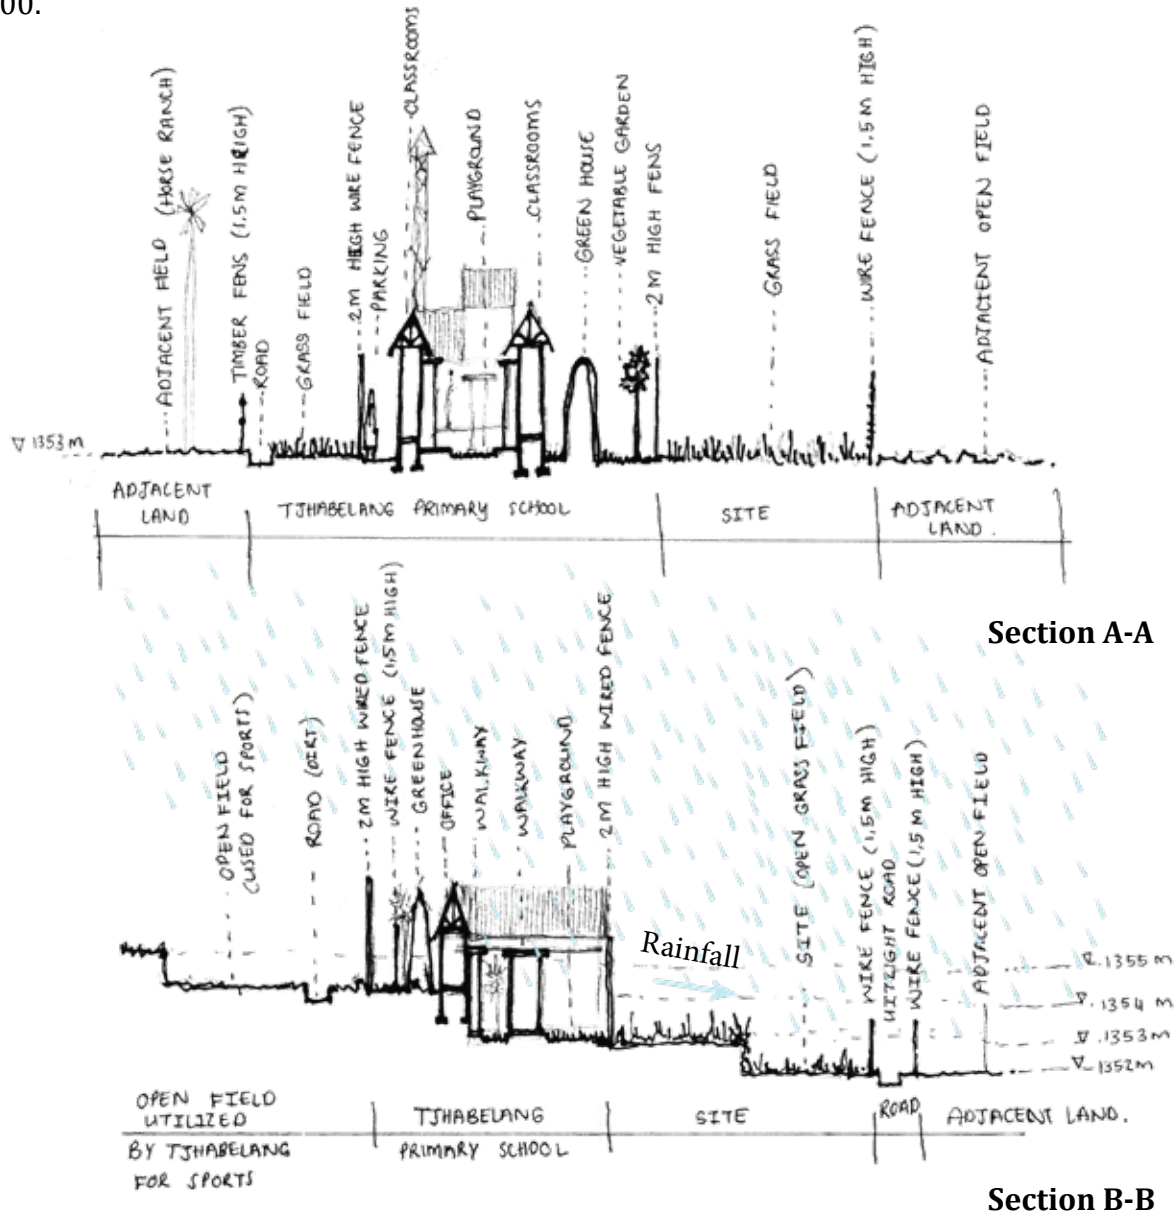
Site Conditions: section A-A (top) and section B-B (bottom) (Caldeira, 2019: drawings).
